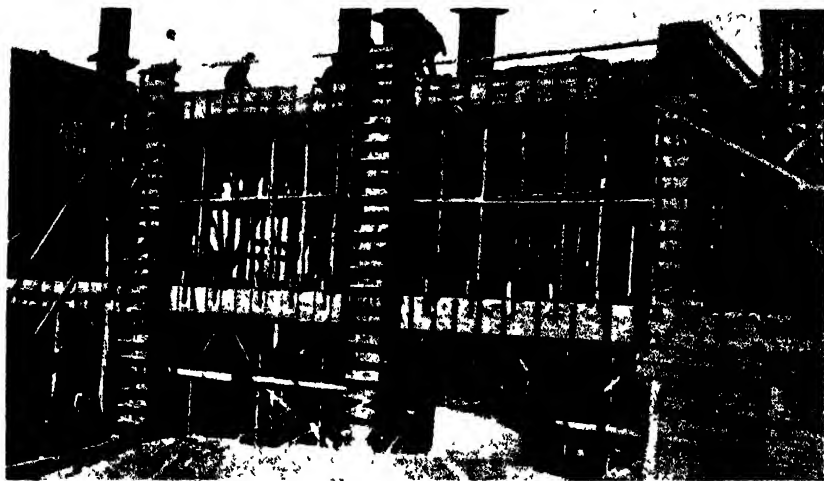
COLUMNS 30 FT. HIGH VERTICAL OUTSIDE BRACES.
